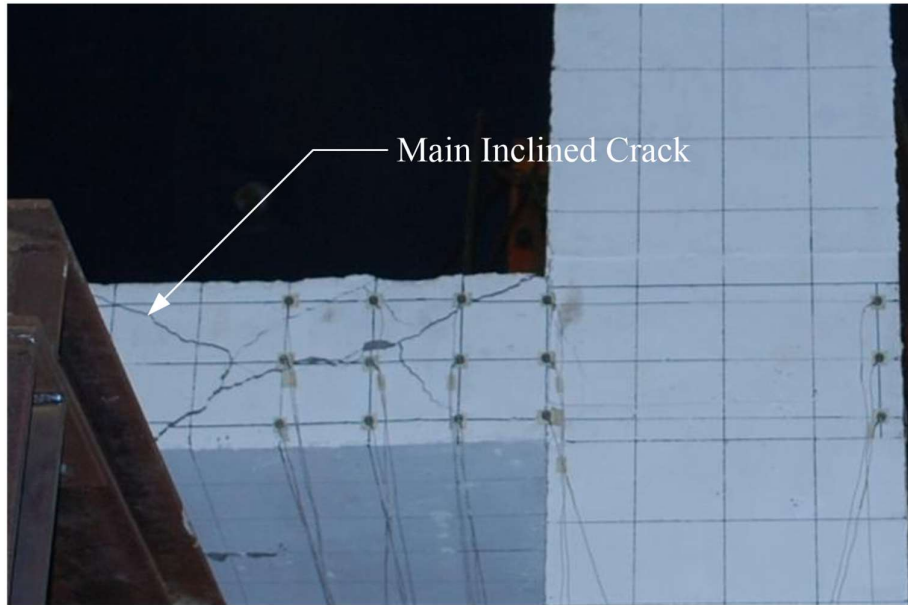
Crack Pattern on the West Slab Face of Specimen R3 at 1.75% Drift
